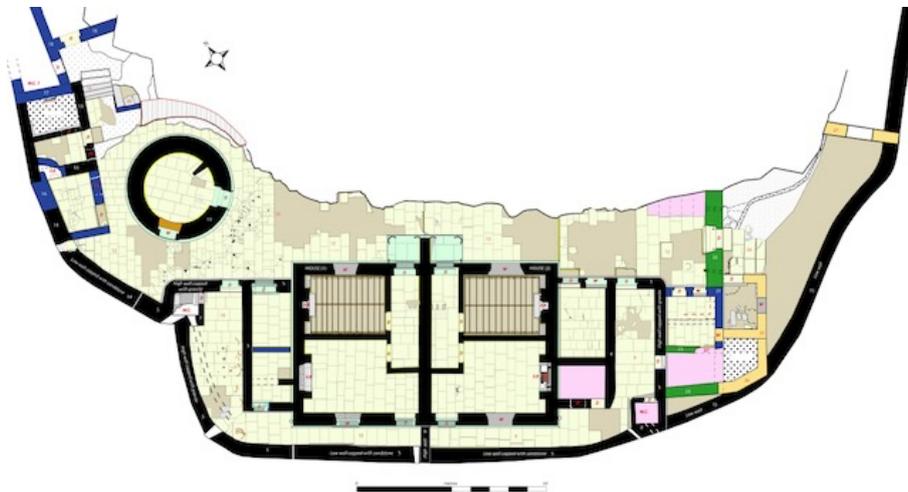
Post excavation plan of the Upper Lighthouse Station (A.R. Hayden)
